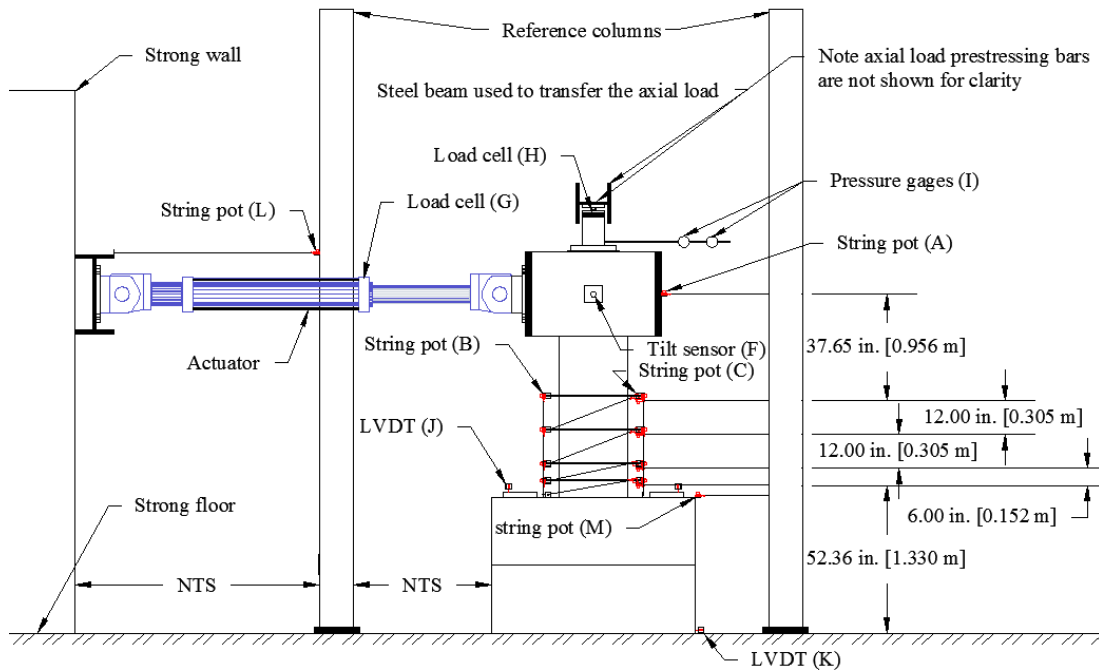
Elevation view of column C5 and C6 external instrumentation (NTS = not to scale)
